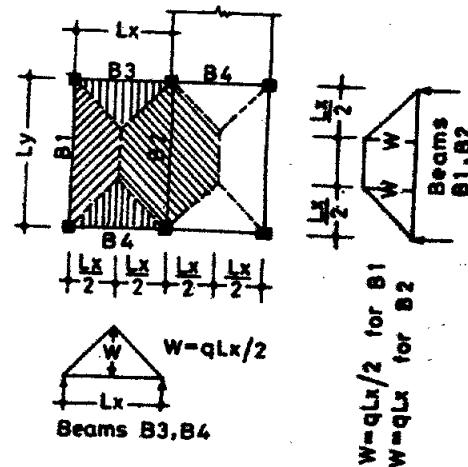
Loads on Beams supporting Two-way Slabs.
